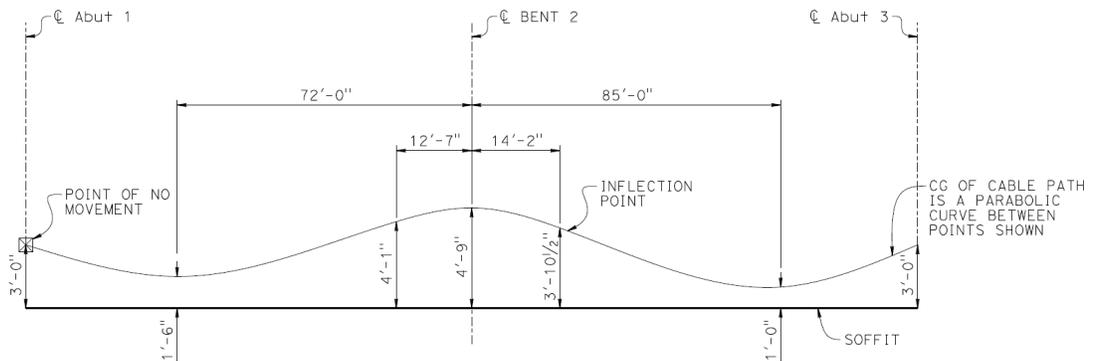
Equal Span Bridge Path of CG of Prestressing Force
